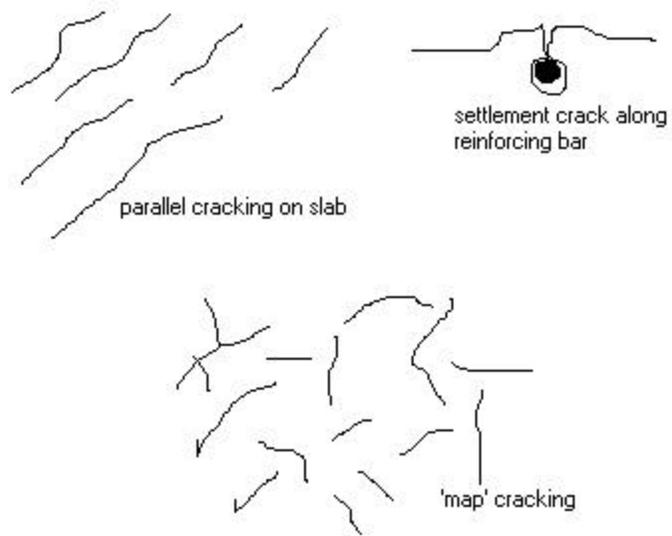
Typical Forms of Plastic Shrinkage Cracking
